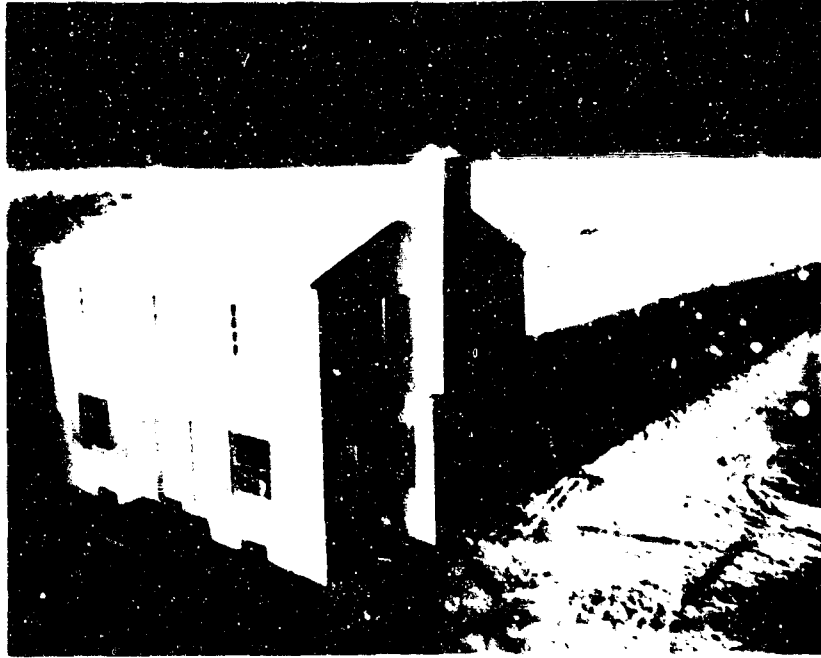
House at 3500 ft, zero time, instant of detonation. The blinding light from the detonation throws the house, the desert, and the surrounding hills into sharp relief.
